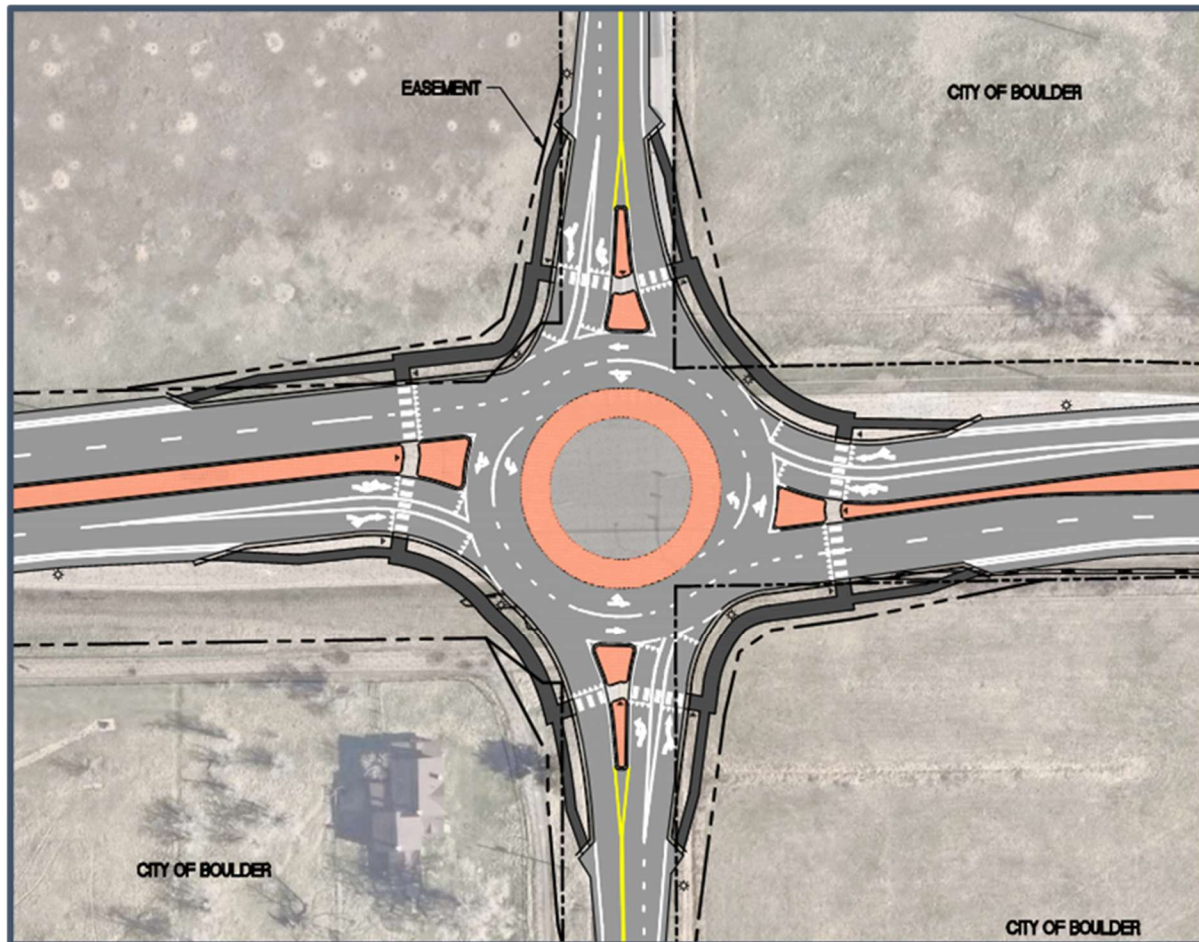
Alternative 2: Multilane Roundabout Concept Plan
